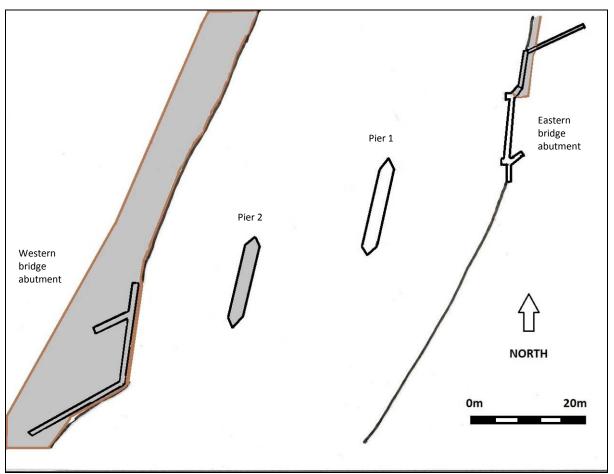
Plan of Camerton Bridge (No. 25). Grey outline denotes lost features and land.
